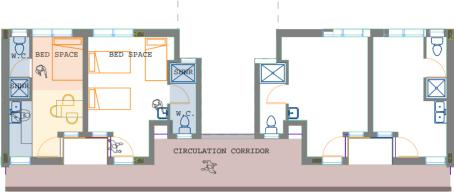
A typical Second-floor unit plan. Author, 2017
